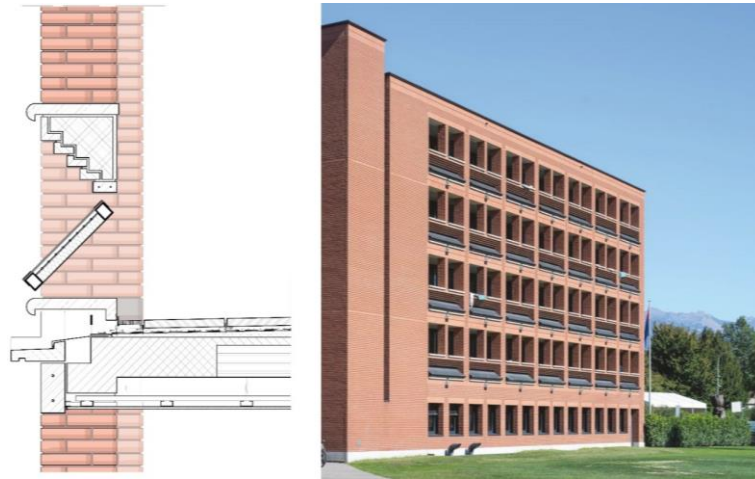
National Youth Sports Centre, “Sasso Rosso” building, Tenero, Switzerland, Mario Botta Architects, 2001 © 2024, Paolo Piantanida, Antonio Vottari (drawing); © 2023 <https://www.espazium.ch/it/attualita/alla-scala-del-paesaggio> (photo)
